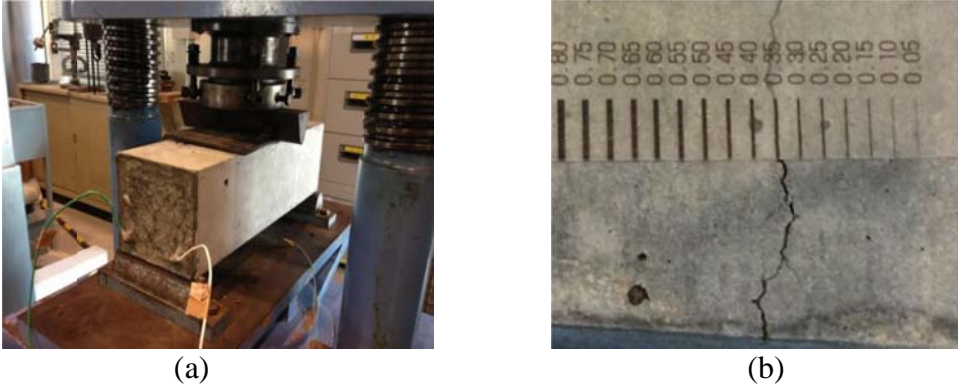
(a) Bending loading for cracking; (b) crack width measurement.
